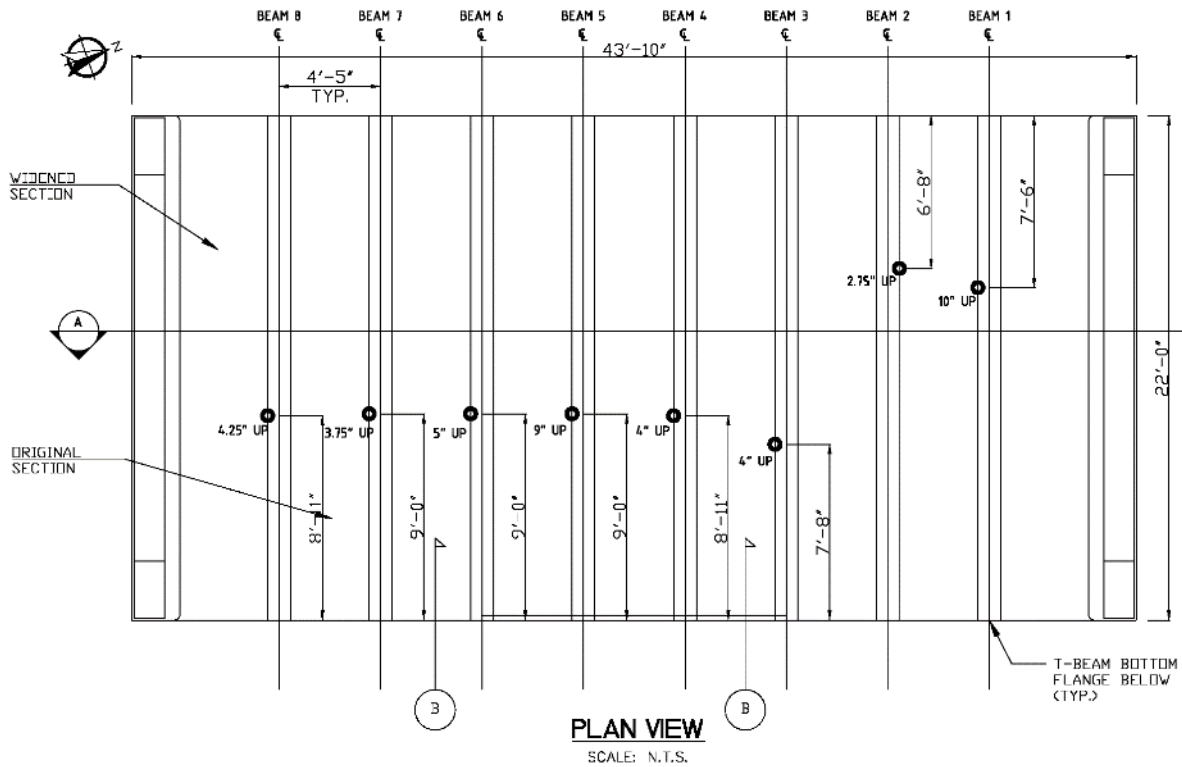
Sensor Instrumentation Plan for Structure 1703152
